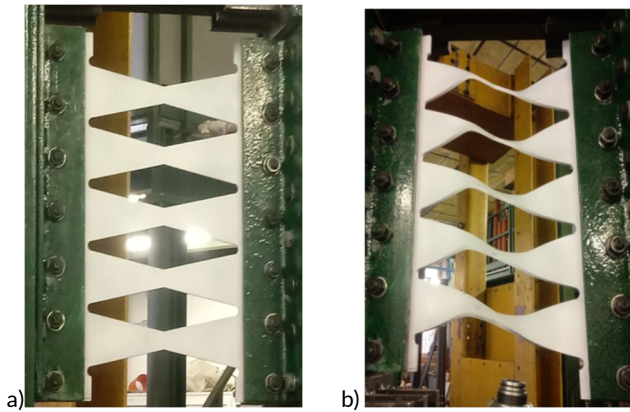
Photo of Specimens A1: a)Start of the test,b) Fracture-end test
